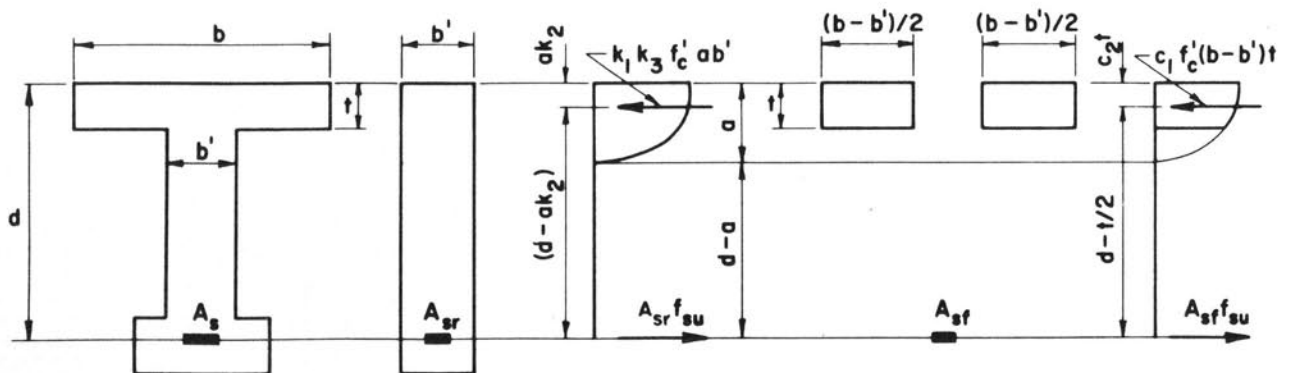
FLANGED SECTION, NEUTRAL AXIS BELOW THE FLANGE
